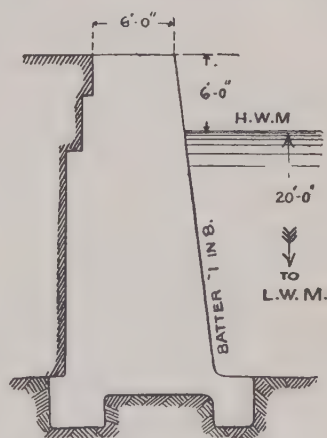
Newhaven Sea-wall (Mass Concrete)
